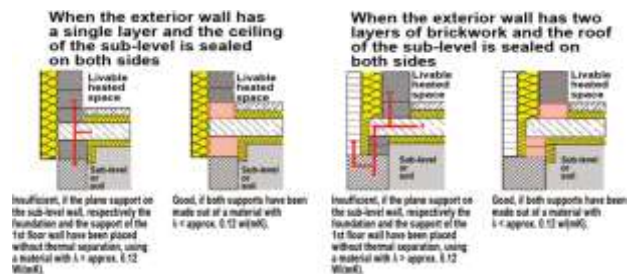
Thermal bridges at the joint between sheets over the sub-level or sheets layered over the soil and exterior walls.
